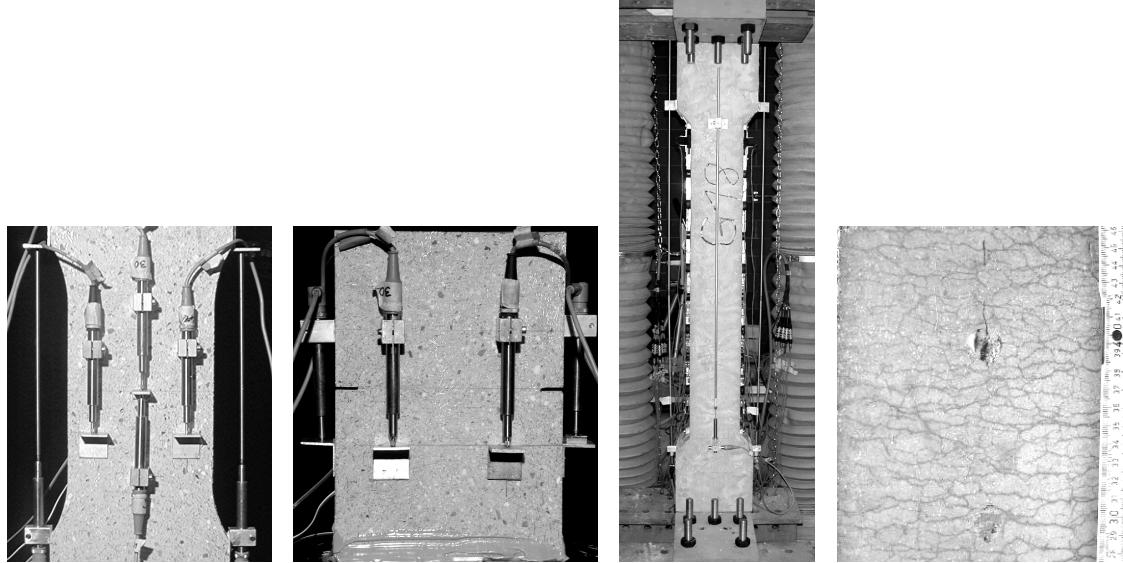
Material test on unnotched and notched specimens, reinforced tension member and crack pattern
